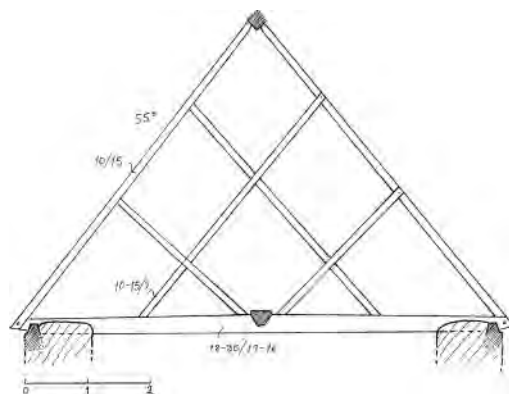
Section of a truss in the nave roof of Valtor Church. Drawing. R. Gullbrandsson.
